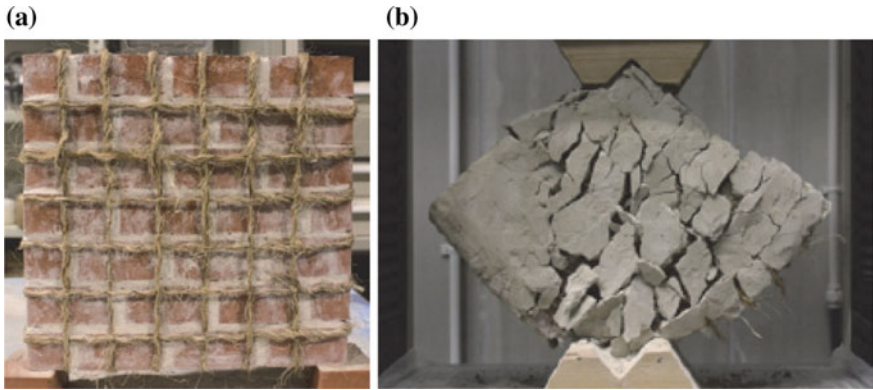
Abaca rope meshes for retrofitting masonry walls (a) and retrofitted wall tested in diagonal compression (b)
